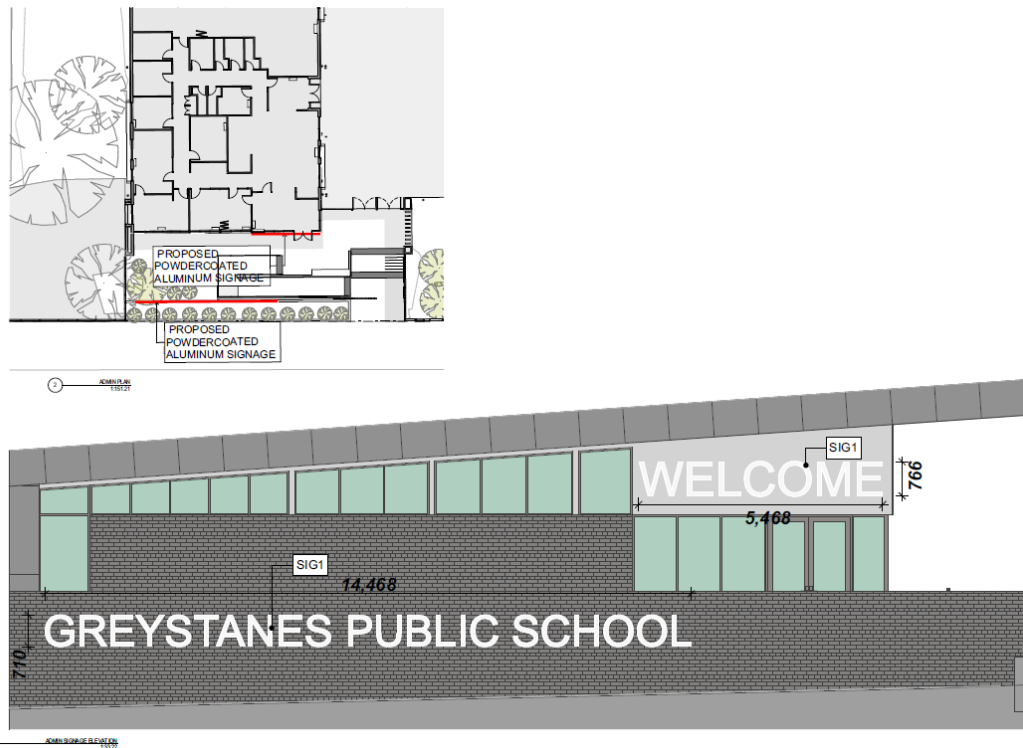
Details of signage on southern elevation of new administration building (JDH Architects)
